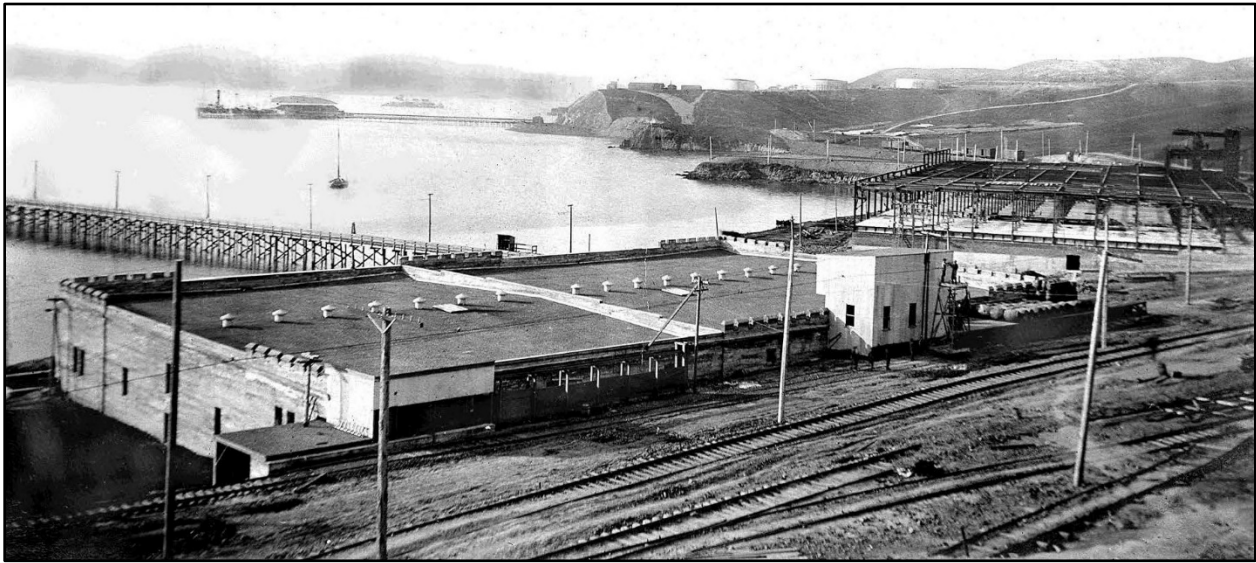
Winehaven and Internal Railroad system under construction next to warehouses, 1907. Note the Richmond Belt Railroad in foreground.⁸
